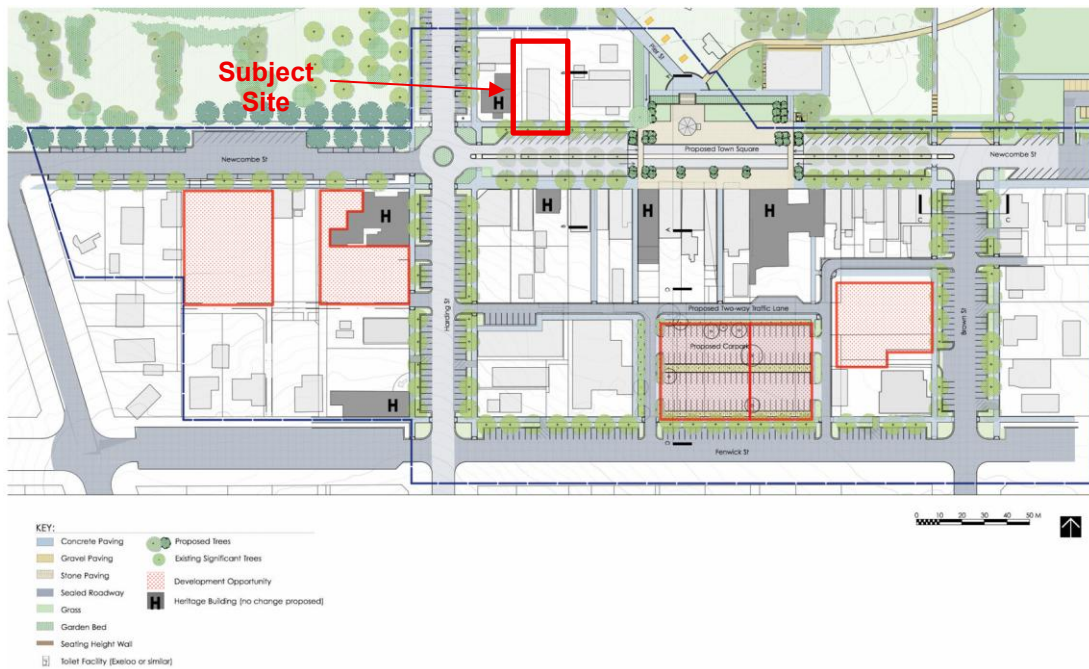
Public Realm Concept Plan (source: Portarlington Urban Design Framework 2011)
